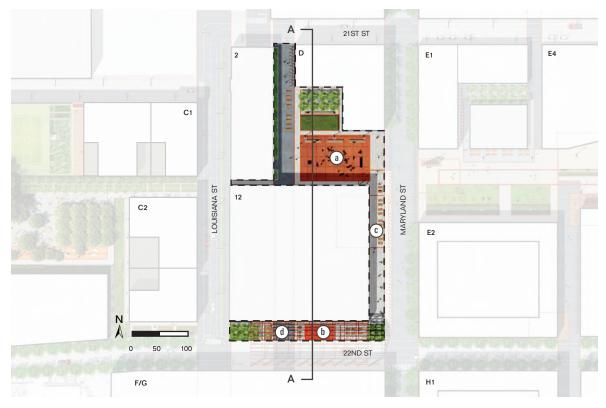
Illustrative Building 12 Plaza and Market Square Plan
